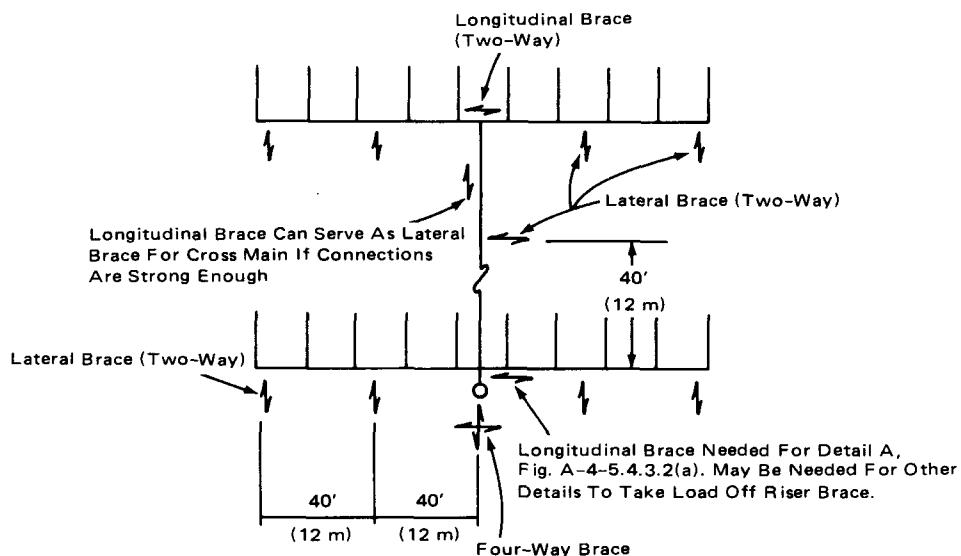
(b) Typical location of bracing on a tree system.
